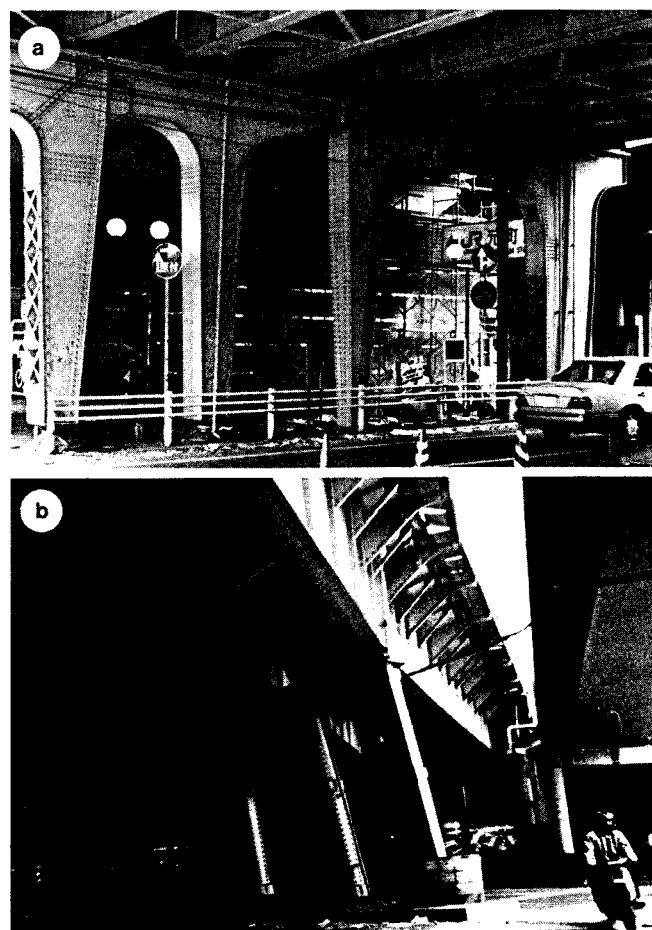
Elevated Harbour Monorail Line: (a) satisfactory seismic performance of steel columns (typical); (b) damaged concrete columns adjacent to a steel column (typical).
